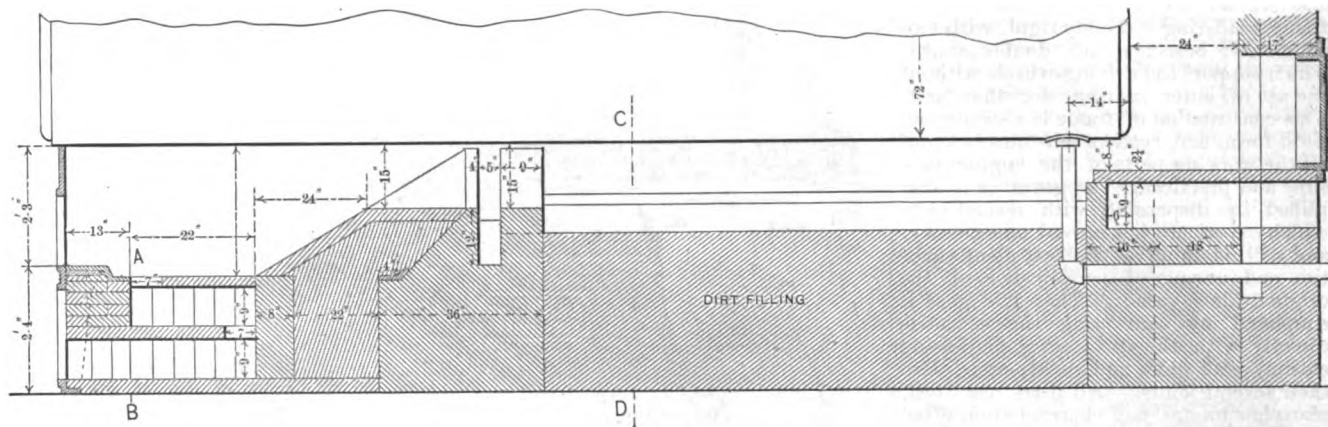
Vertical Section of Boiler Setting with Reid Burner.
